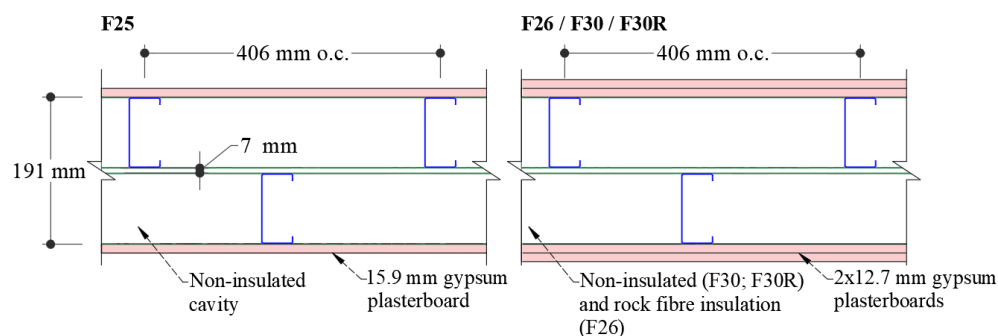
Double row stud walls specimens tested by Kodur and Sultan (2006).
